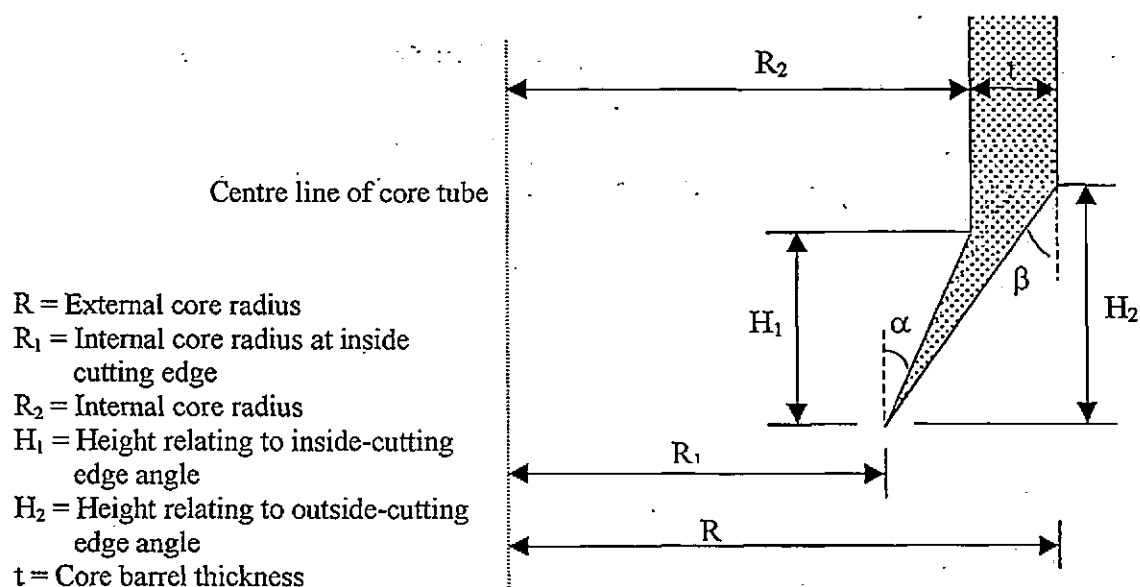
Dimensions of a tube sampler (Clayton et al., 1998)
